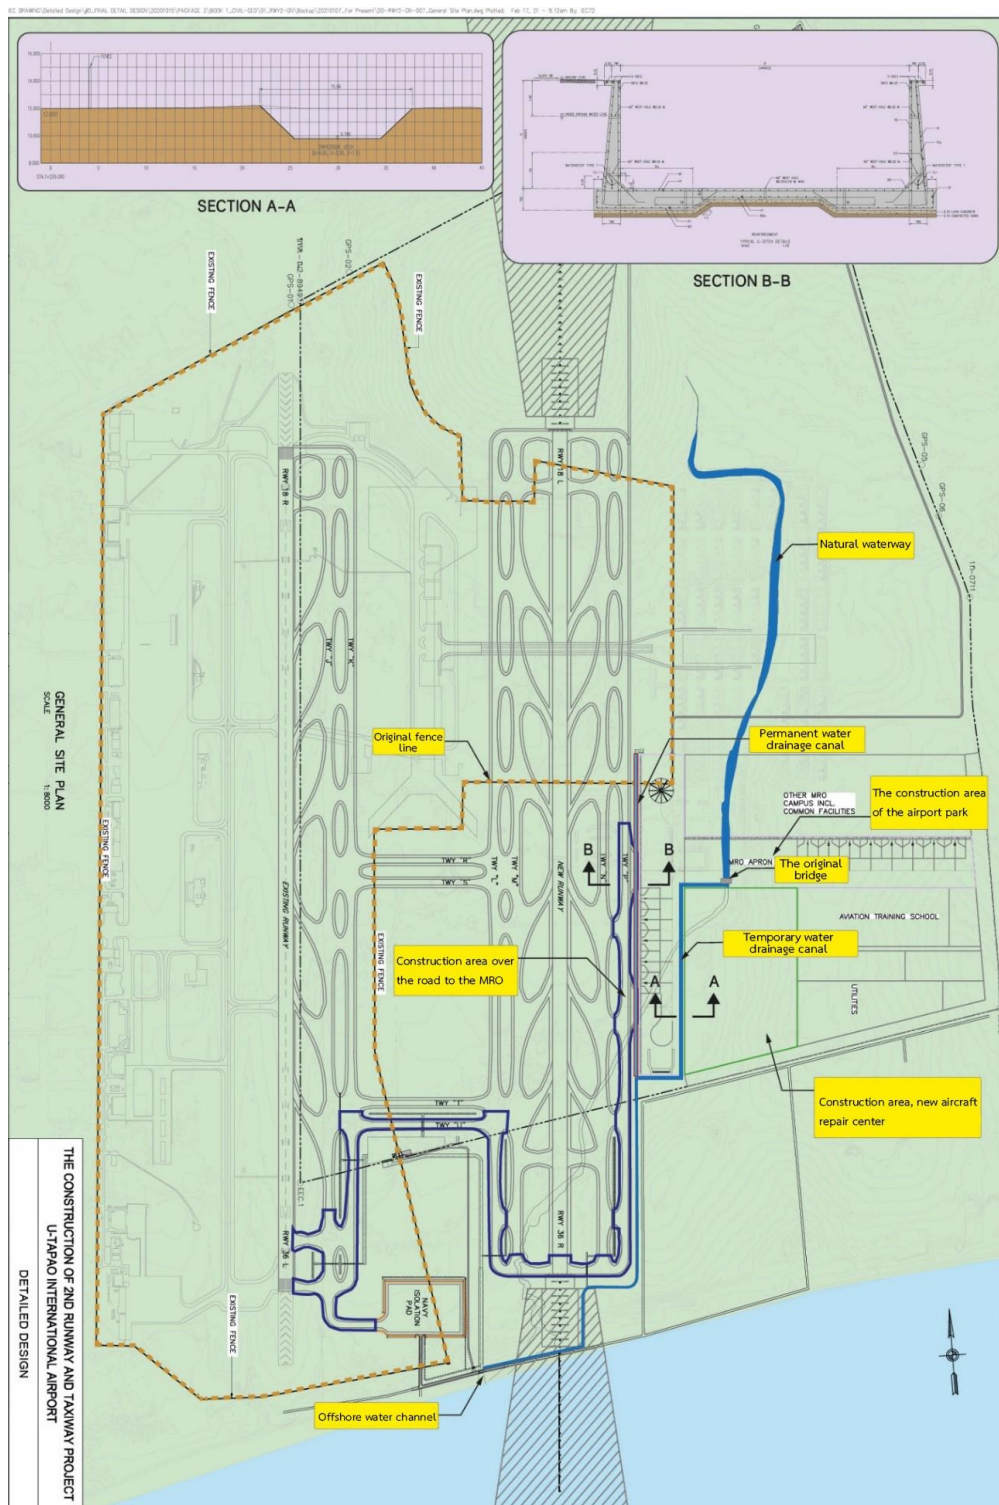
□ 2 Drainage system in the area of soil filling work to adjust the area for the construction of the driveway connecting runway 1
